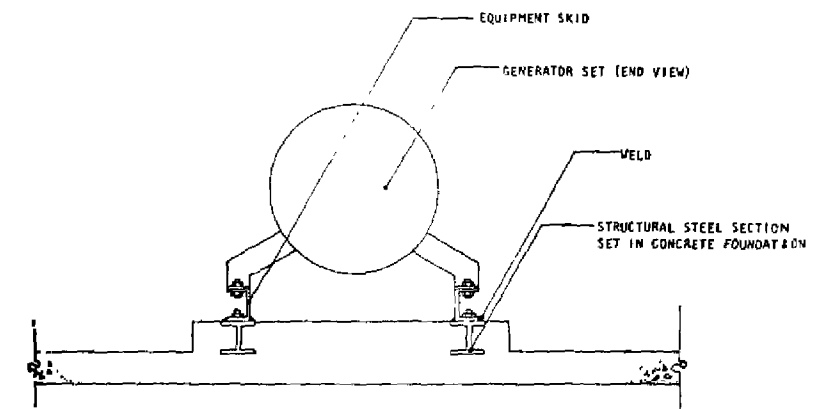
Emergency power supply systems. Generator set showing fixed anchorage to structural concrete.
